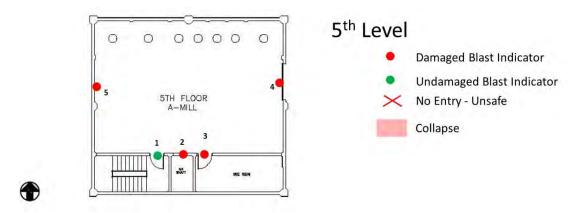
Level 5 of Mill A & B Blast Damage Indicators
